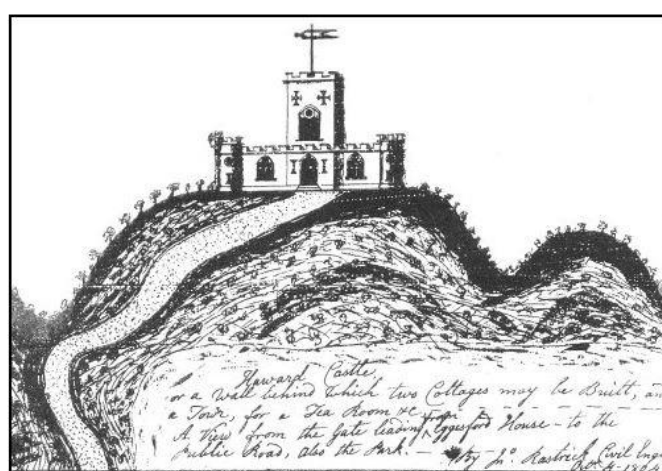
Sketch of Proposed Folly for Heywood Castle, DHC 14822/E/4.
